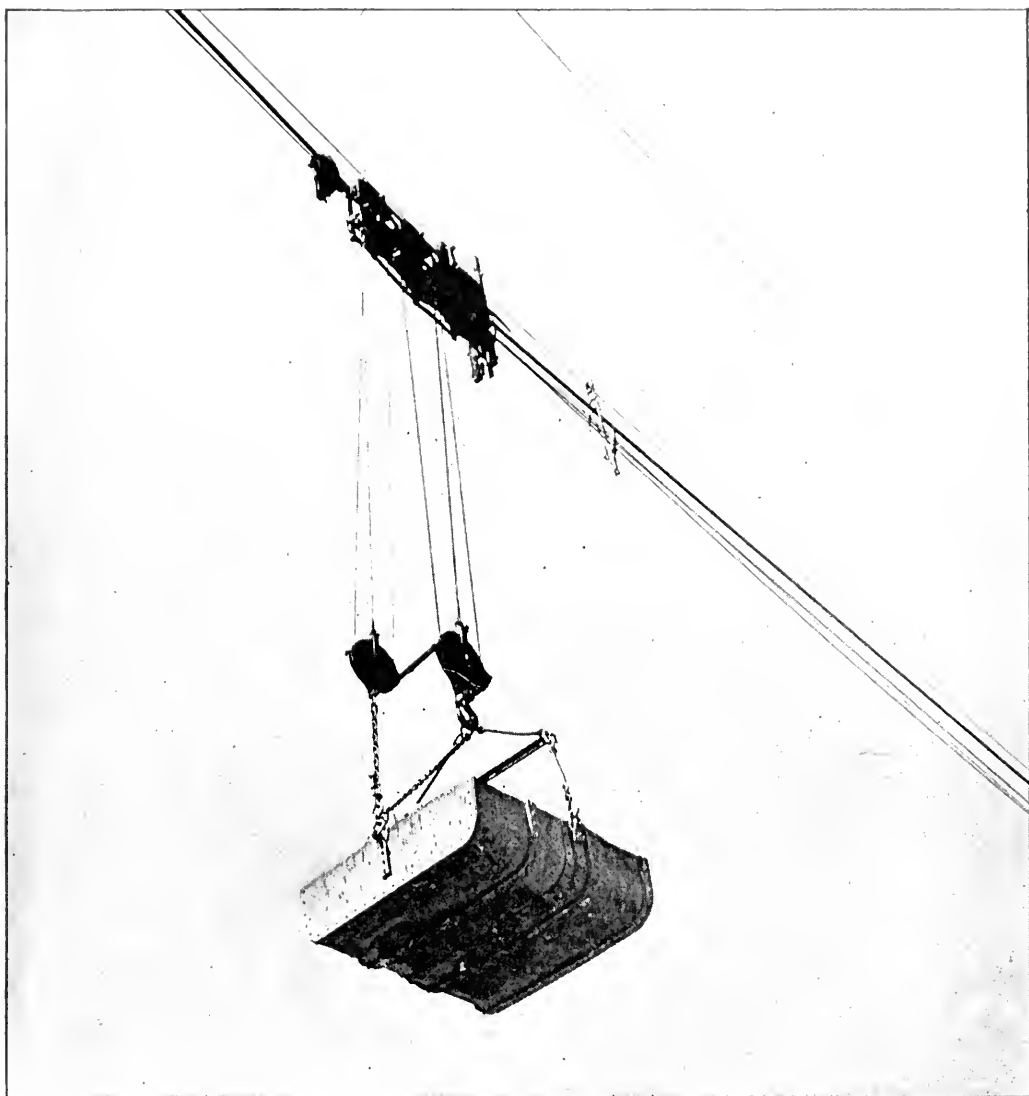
SKIP FOR THE CABLE HOIST CONVEYOR, SHOWING ATTACHMENT OF "AERIAL DUMP." TACKLE AT BACK OF SKIP.
